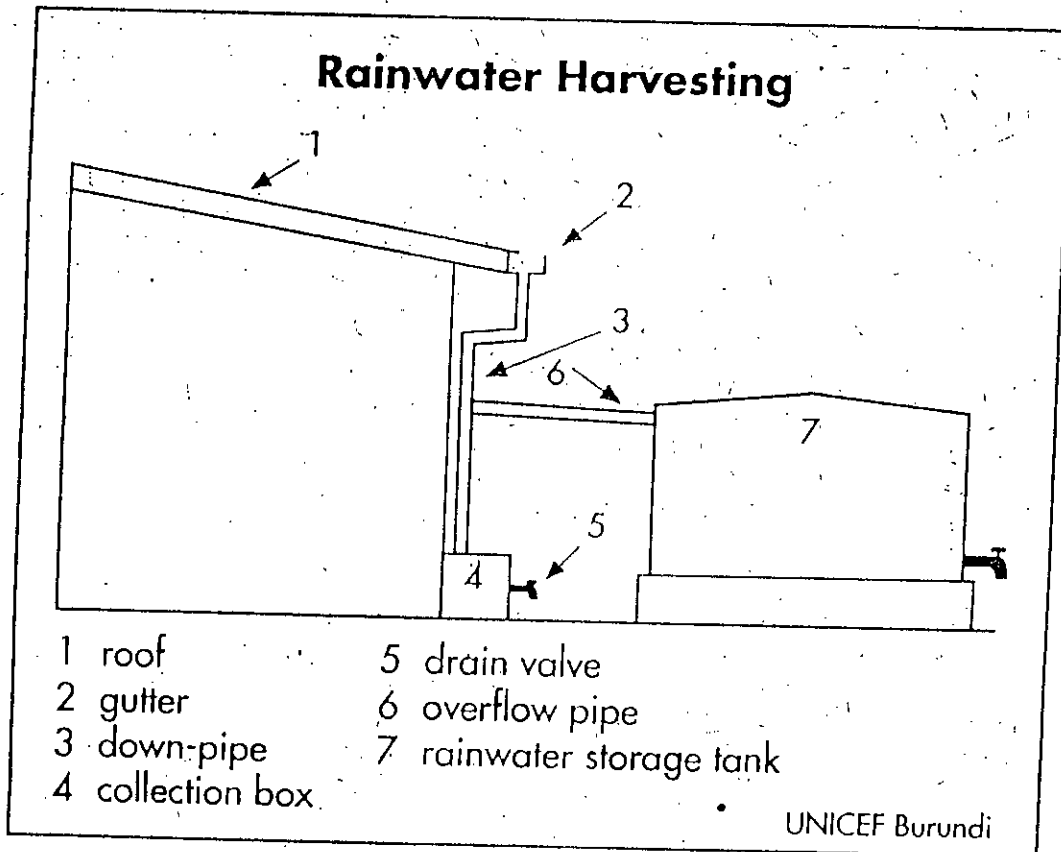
Typical Diagram Showing Rainwater Harvesting
